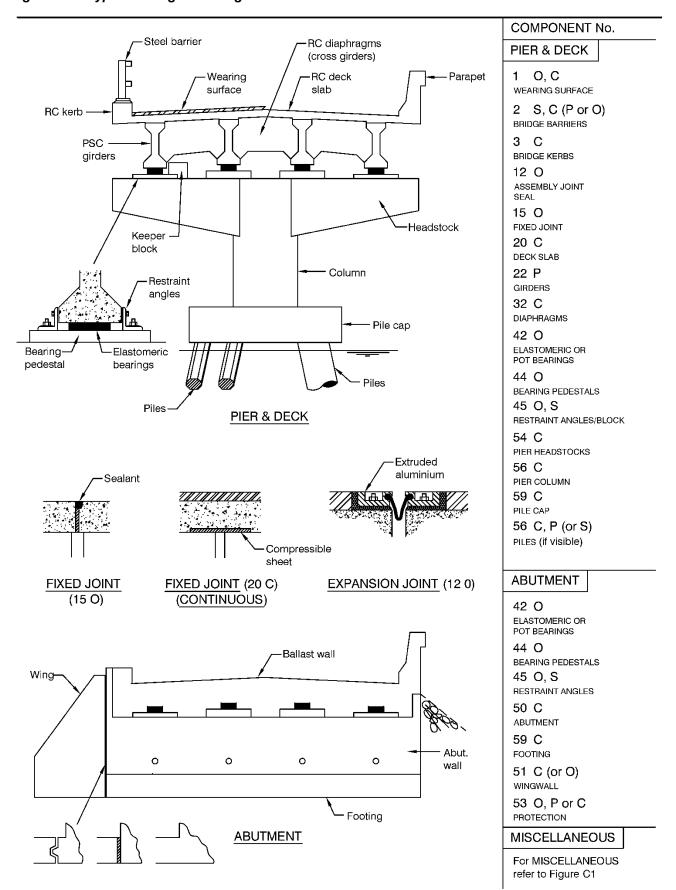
TYPICAL PSC GIRDER BRIDGE
